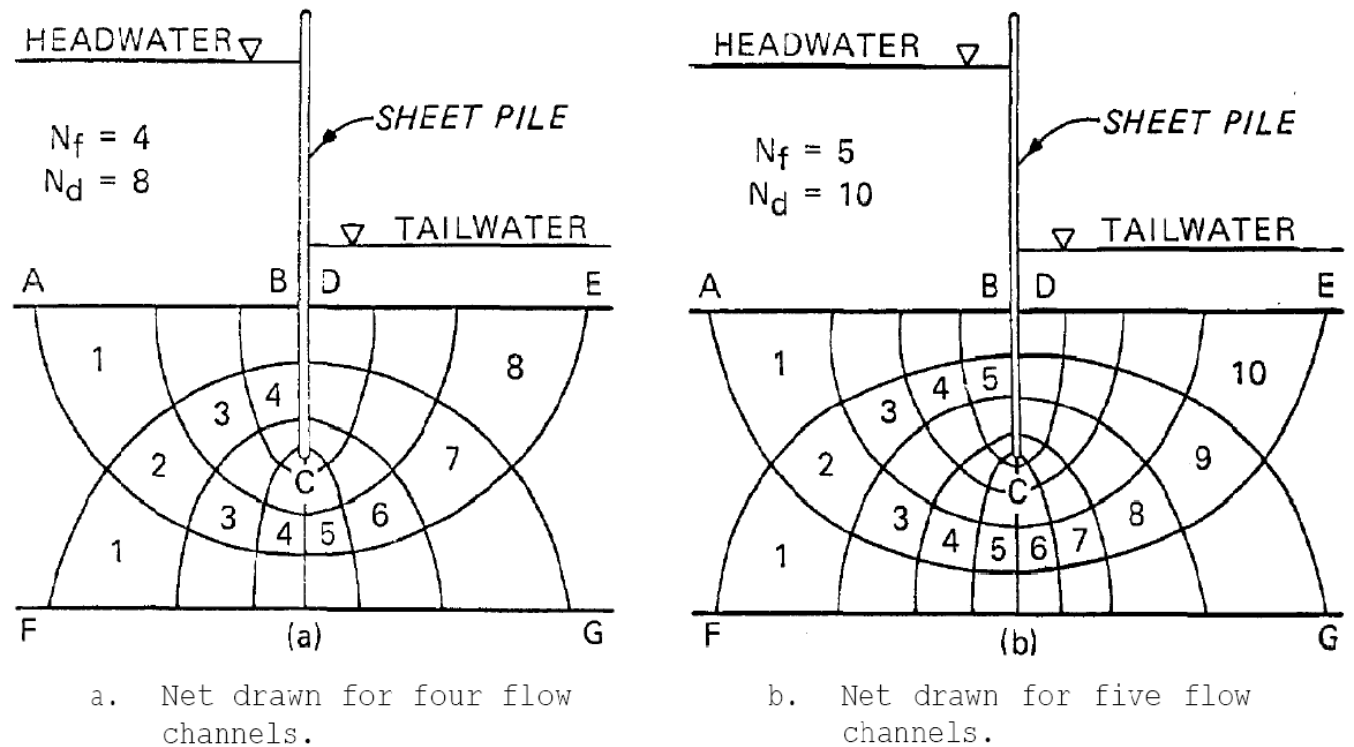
Flow net for a sheetpile wall in a permeable foundation
